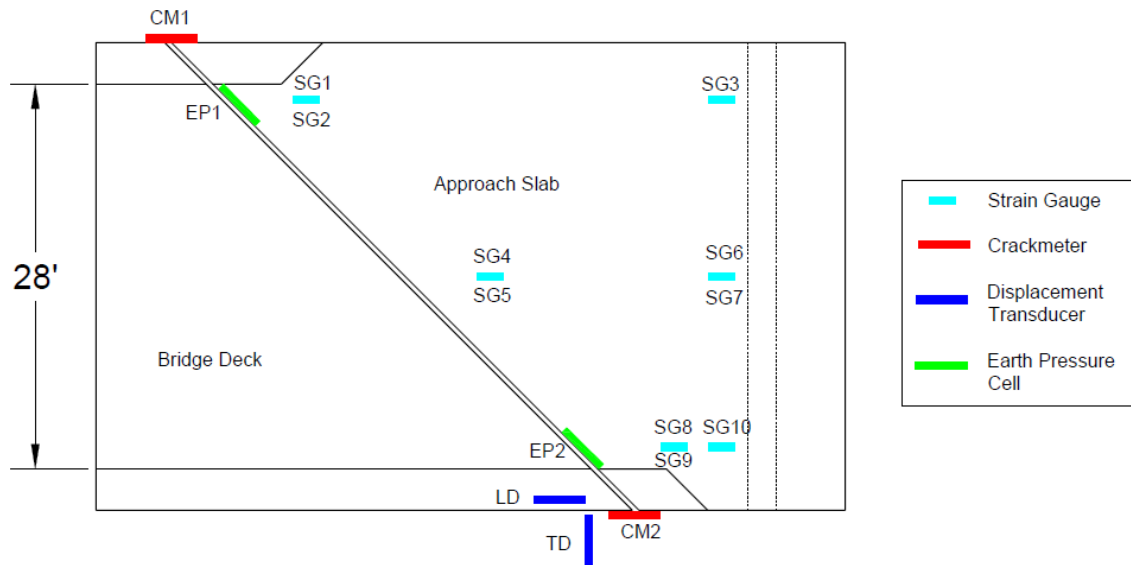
Jasper – Instrumentation Plan (Typical of East and West Ends)
